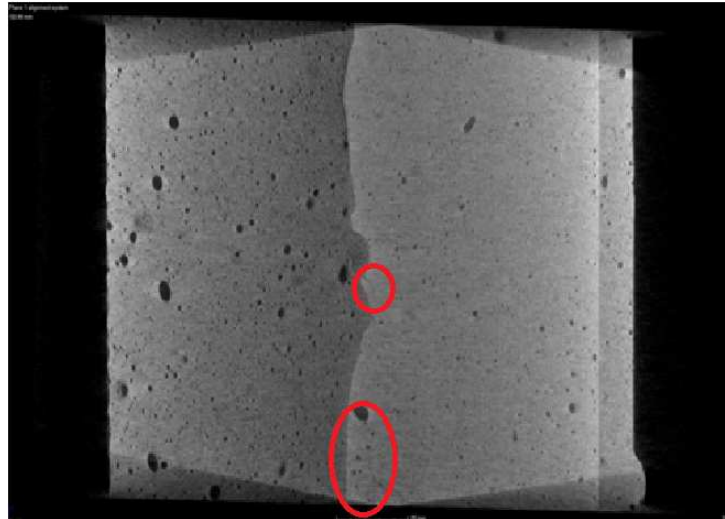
b: Induced Cracks (2) in testing blocks. 3D Tomography method
